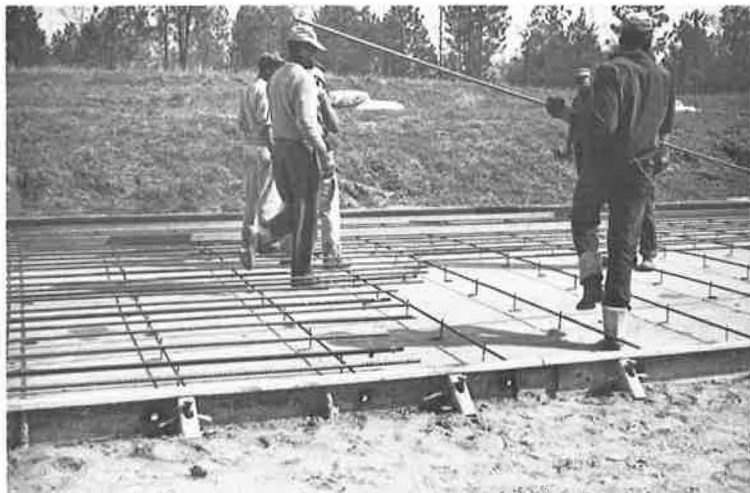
Placement of bar reinforcement in west pavement (Jones County).
